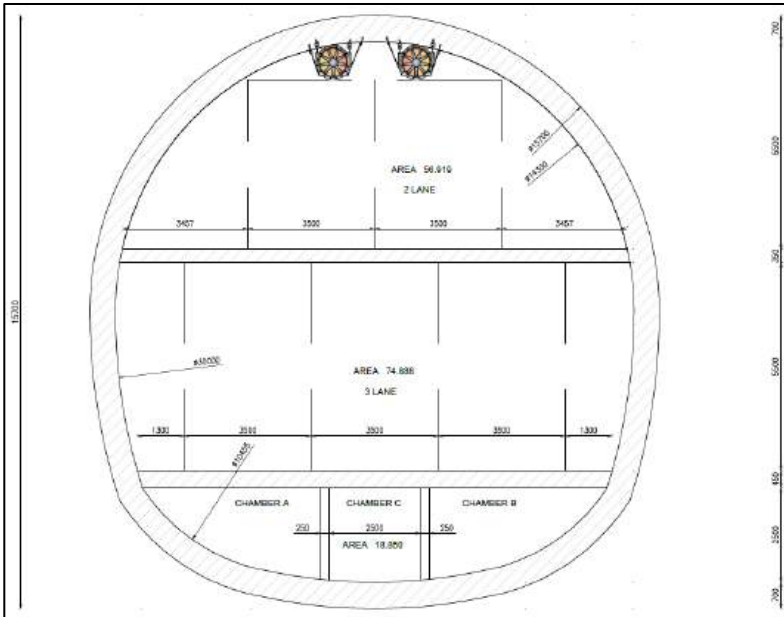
5-Lane Horse Shoe Tunnel Typical Cross Section
